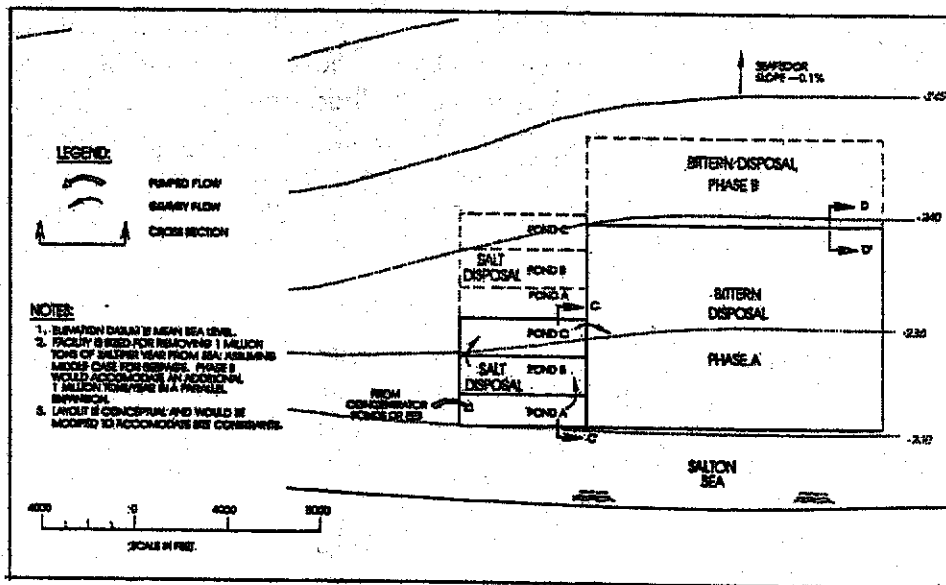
Alternative Concept E Layout for In-Sea Disposal Impoundments with Parallel Expansion
